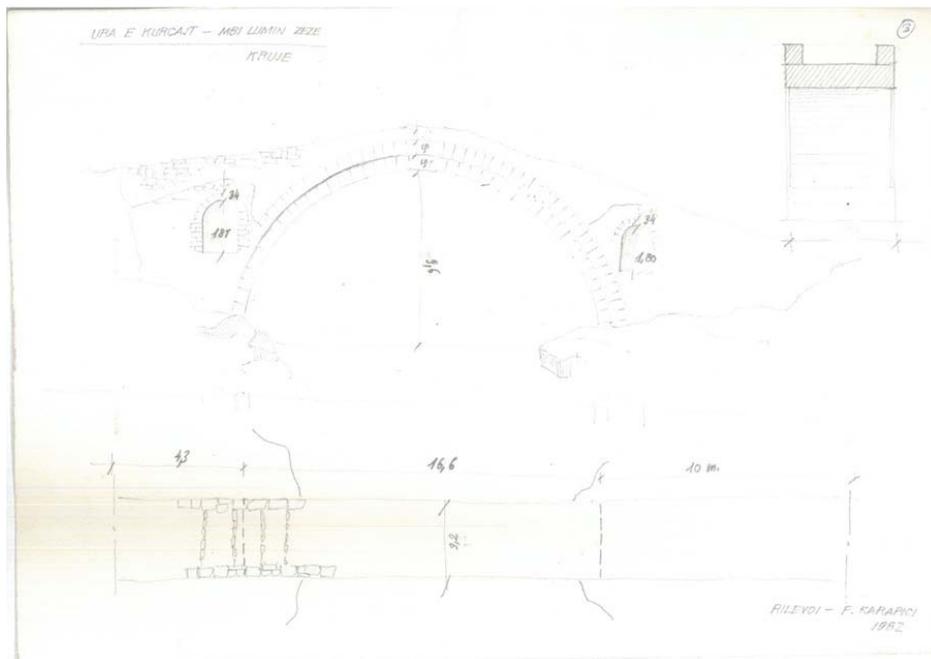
Existing planimetry (extracted from the IMK Archive)
